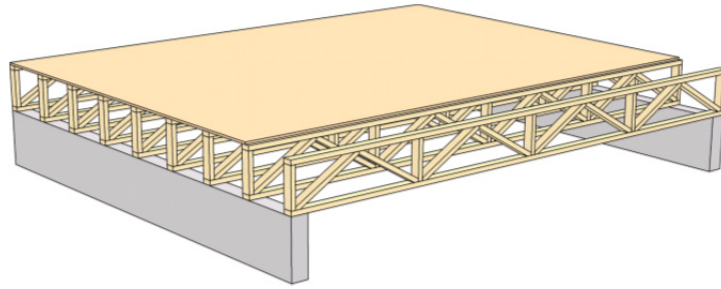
Schematic arrangement of wood trusses on top of glue-laminated beams covered by OSB boards.
